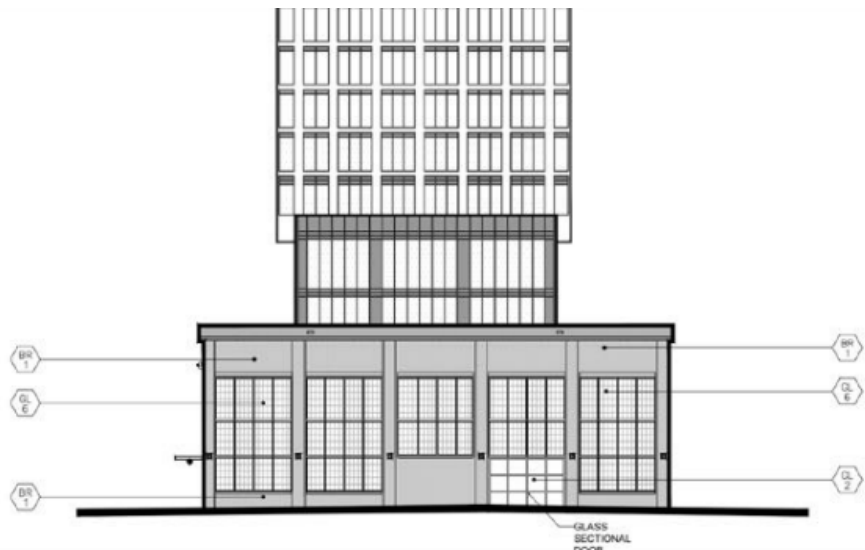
Proposed east elevation of 185 Eastern Avenue (Machine Shop building) (Core Architects Inc., 2026).
